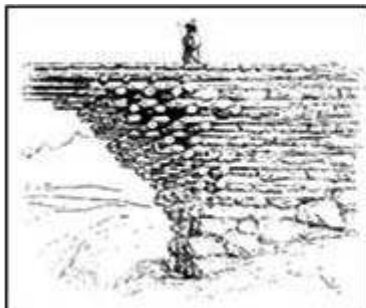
Outside Cantilevering Abutment Drawn By Viollet-Le-Duc
